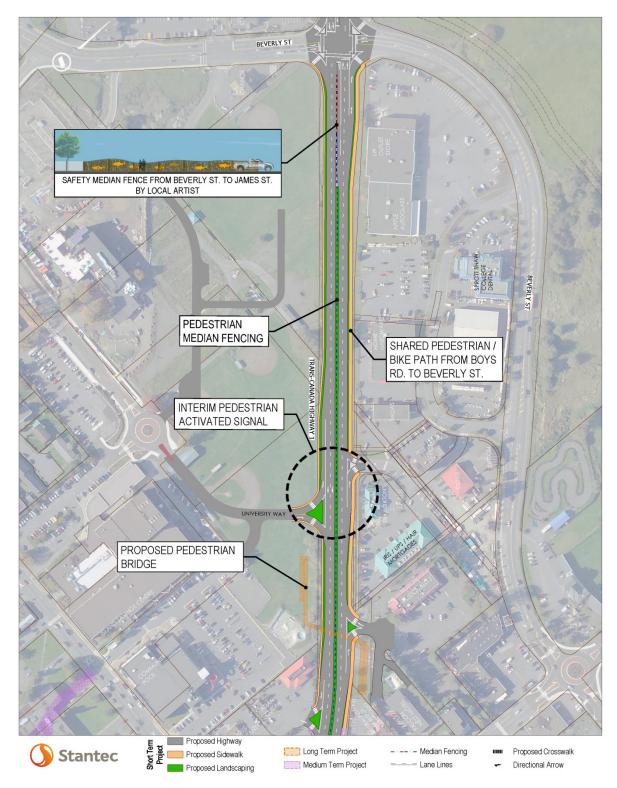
TCH Project Sequence–James Street/York Road to Beverly Street
